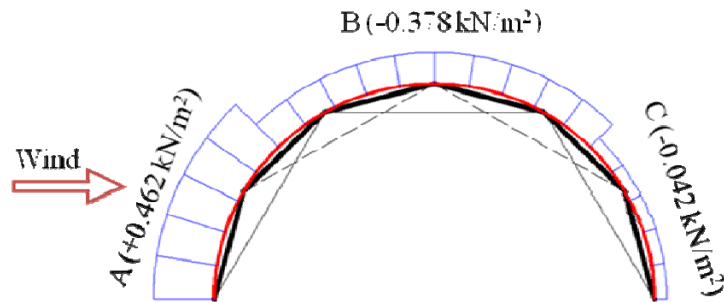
Wind load on barrel vaulted roof (Load case 2).
